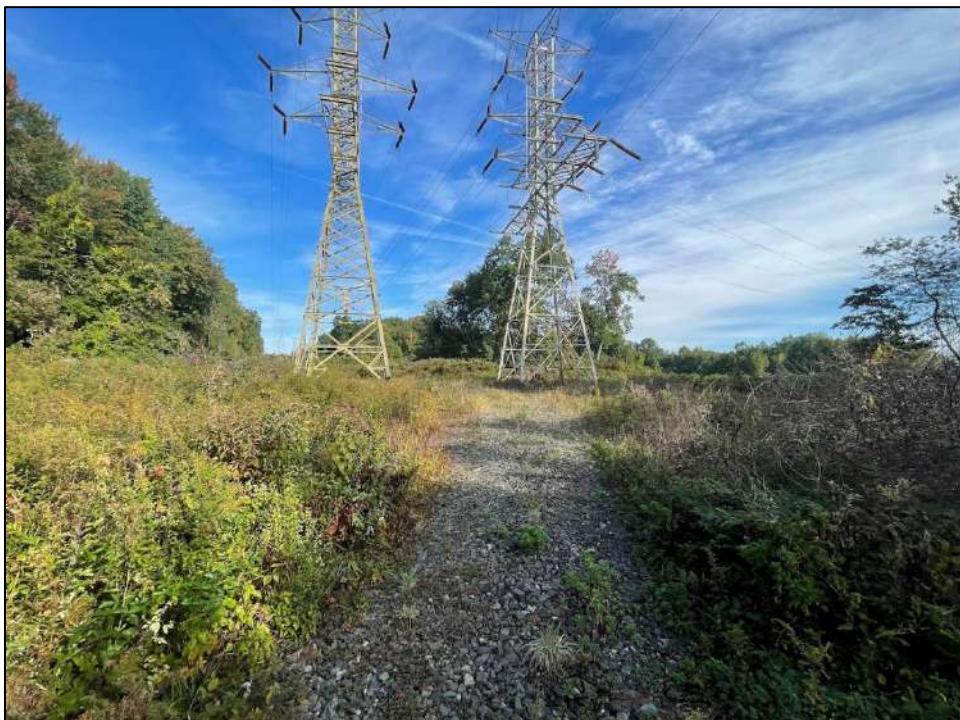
Overview photo showing western end of project corridor facing east (photo taken on October 12, 2021).
